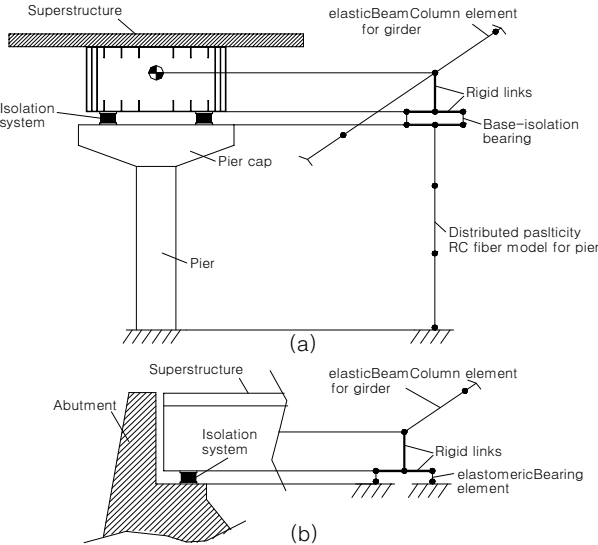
Modeling scheme of the isolated bridge in OpenSees (a) pier-girder and (b) abutment-girder connection
